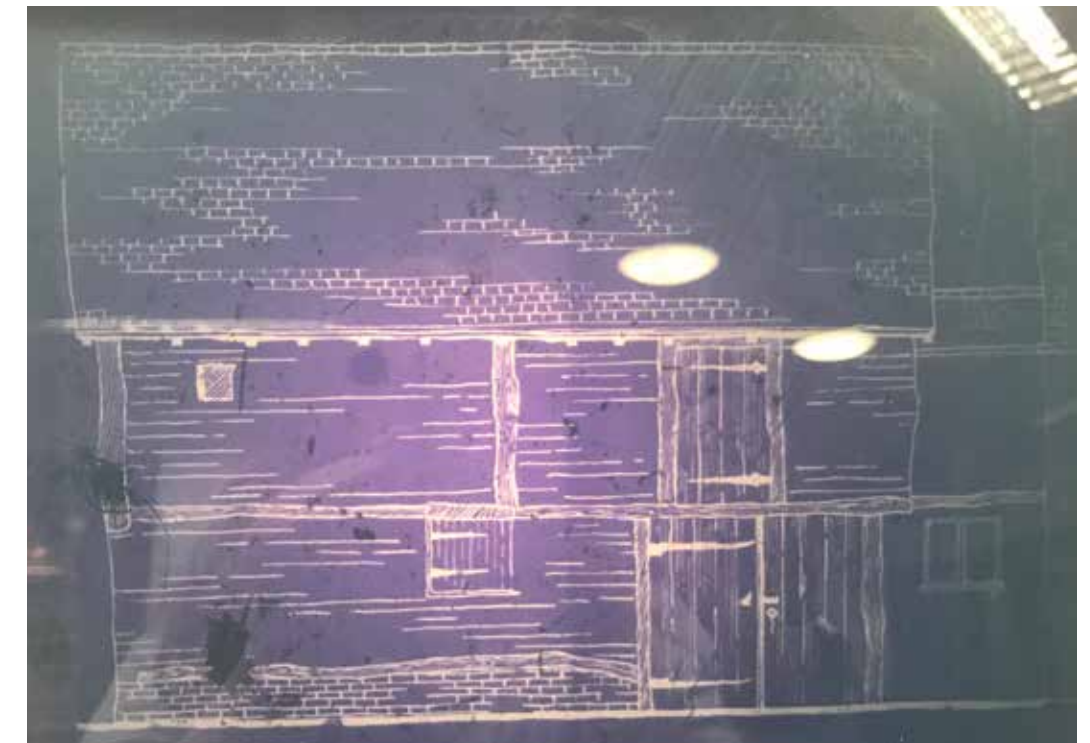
1949 application for Club Room, existing elevation of Oak Room
